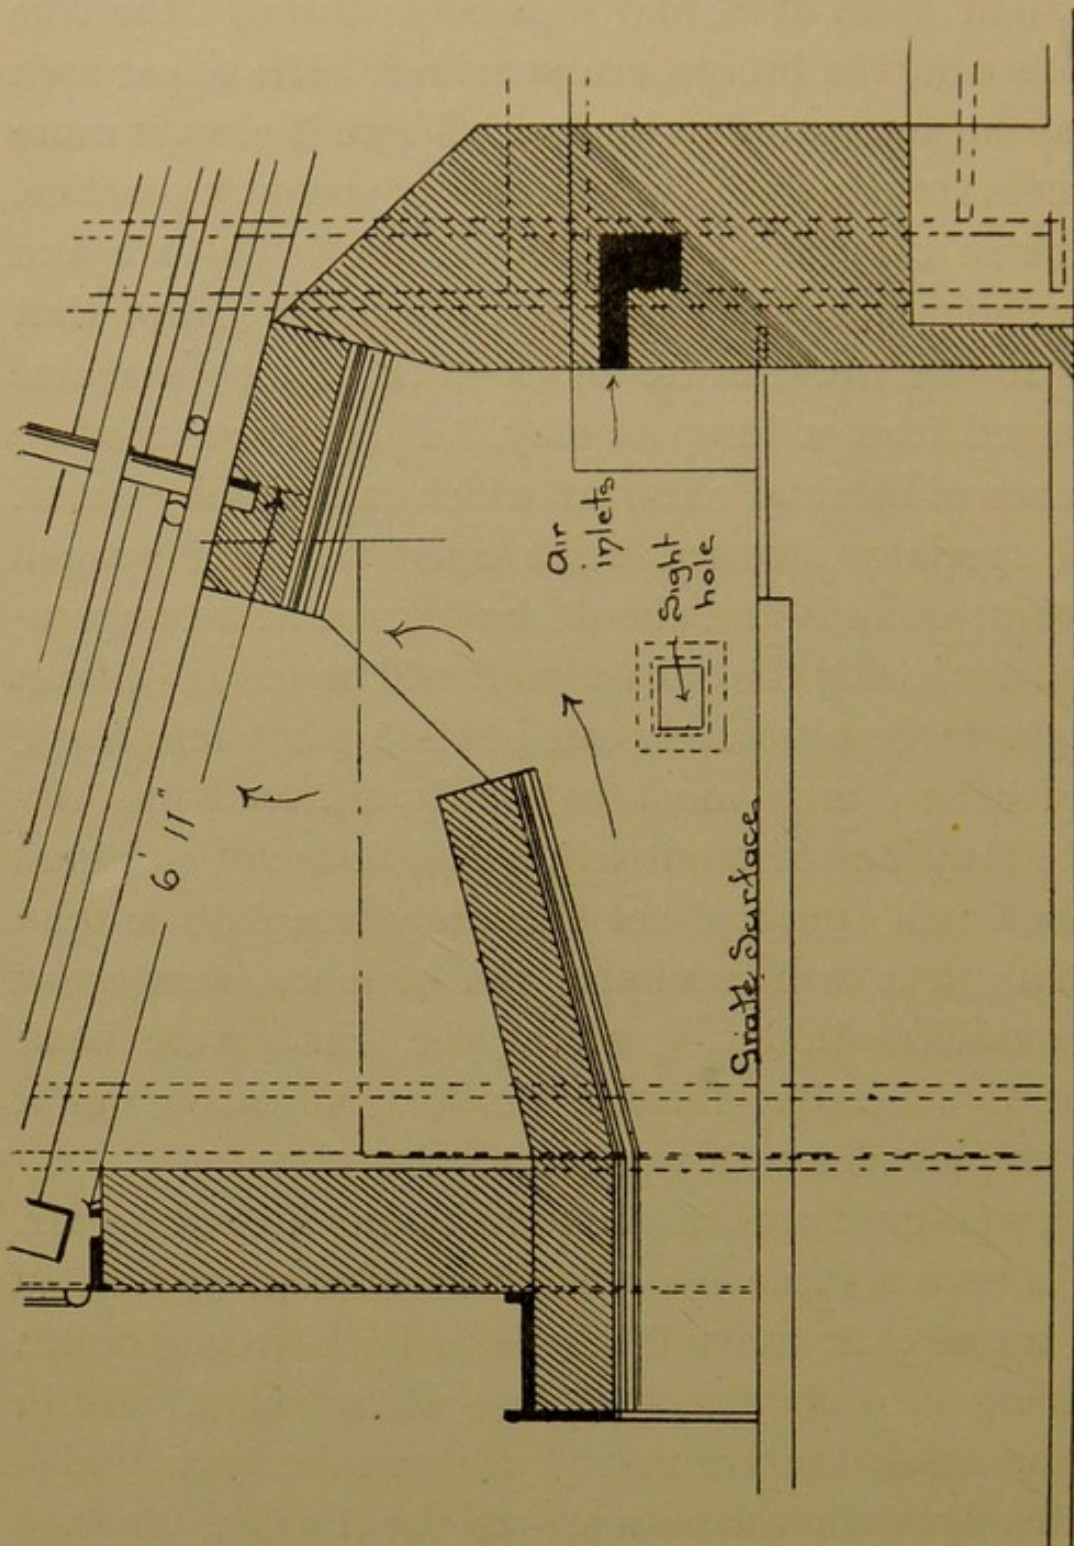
REFRACTORY FURNACE FOR WATER TUBE BOILER.
